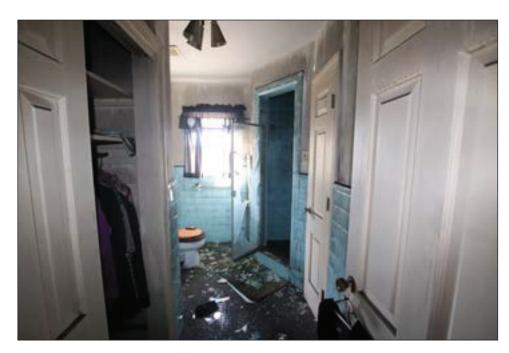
Example of smoke damage and vandalism at MD-IP-2 upstairs bathroom (view to the west).
